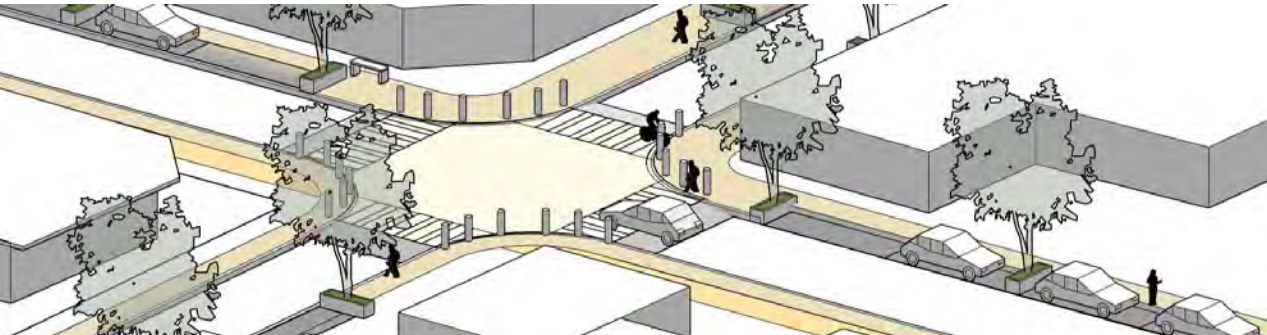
Sidewalk detail typical section overview (Downtown Lafayette, NU: 2020)
